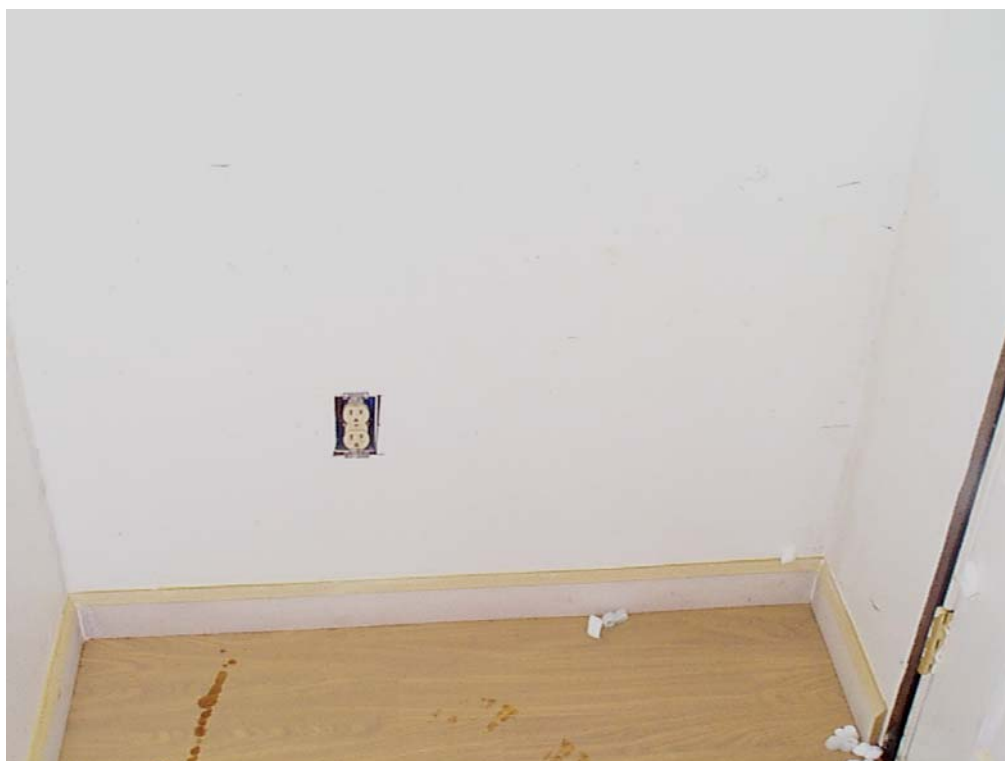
Module C-3 (Wall 2) Day 8 – Before washing. *Note: "Pellets" on the floor at right bottom are Styrofoam which was placed on the floor of the unit prior to flooding. As floodwater rose, the pellets floated, and cameras could record locations where water appeared to flow into the unit.
